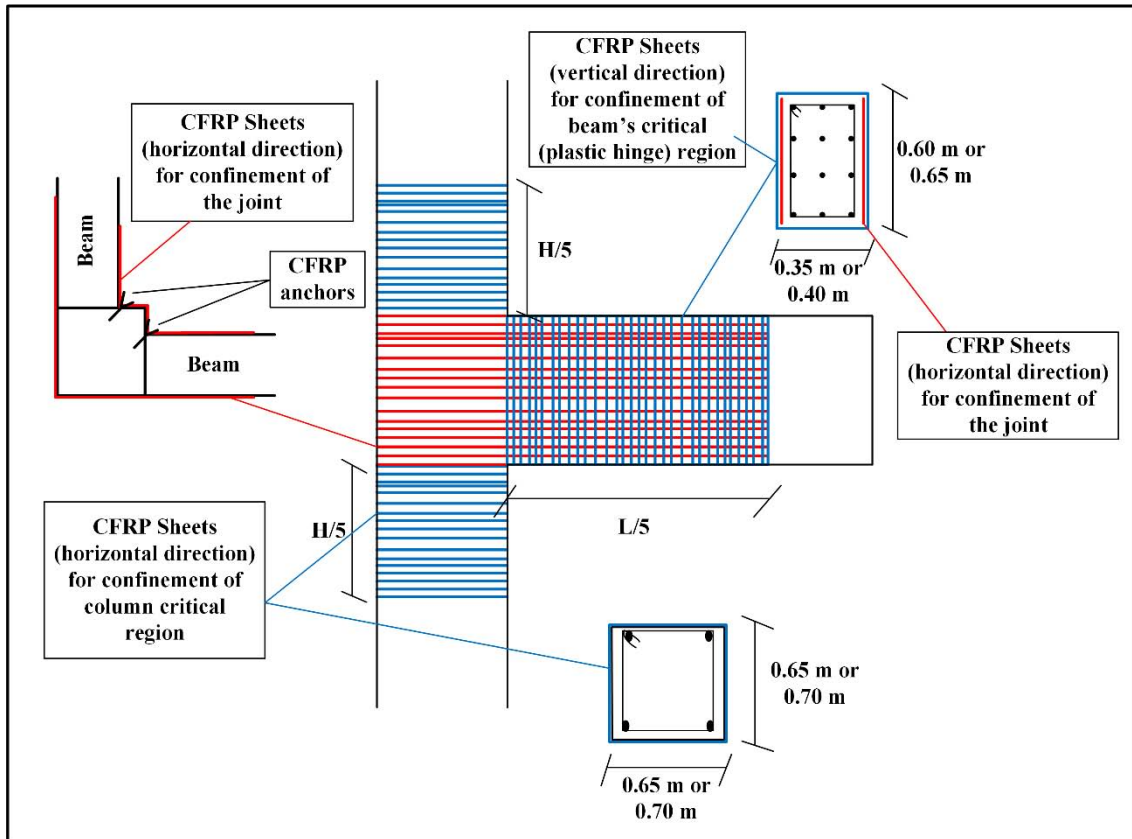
Application of CFRP sheets for strengthening of structural members of *Building C*.
